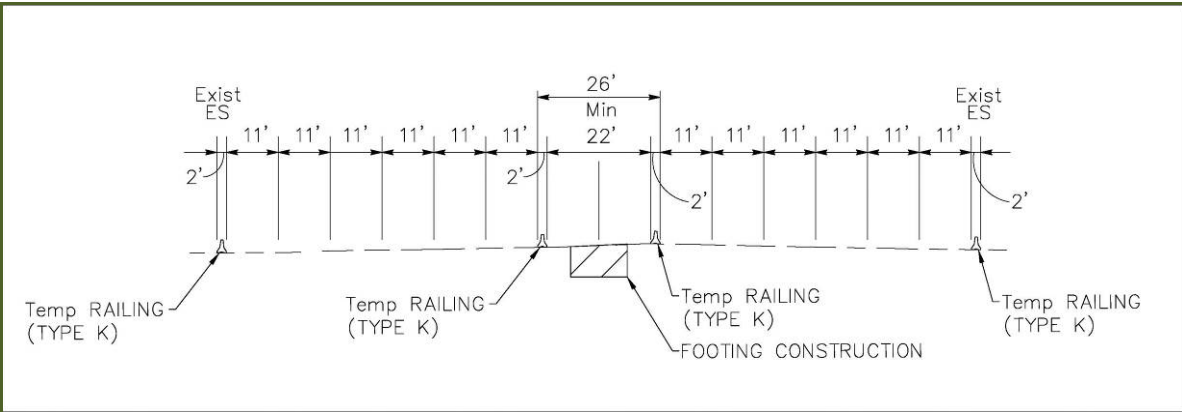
Proposed Temporary Highway 101 Cross Section- Construction Stage 1
